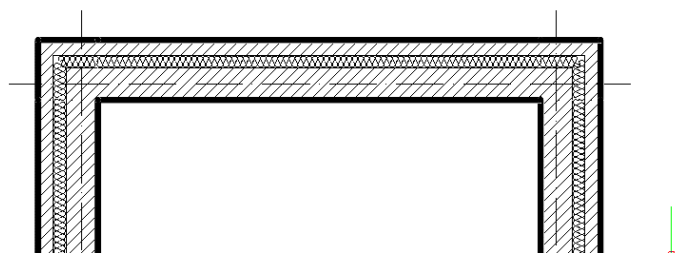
Wall with the intersection outline pen with the projection/cross-section plane at 0.5 and the line separating the load-bearing layer of the wall at 0.18 (like other pens)
